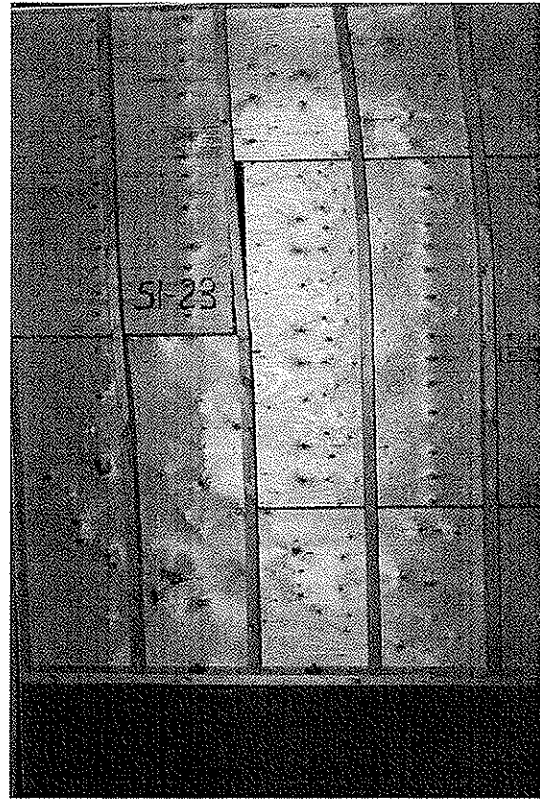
Step failure pattern of unblocked shear walls under wall configuration 3.
